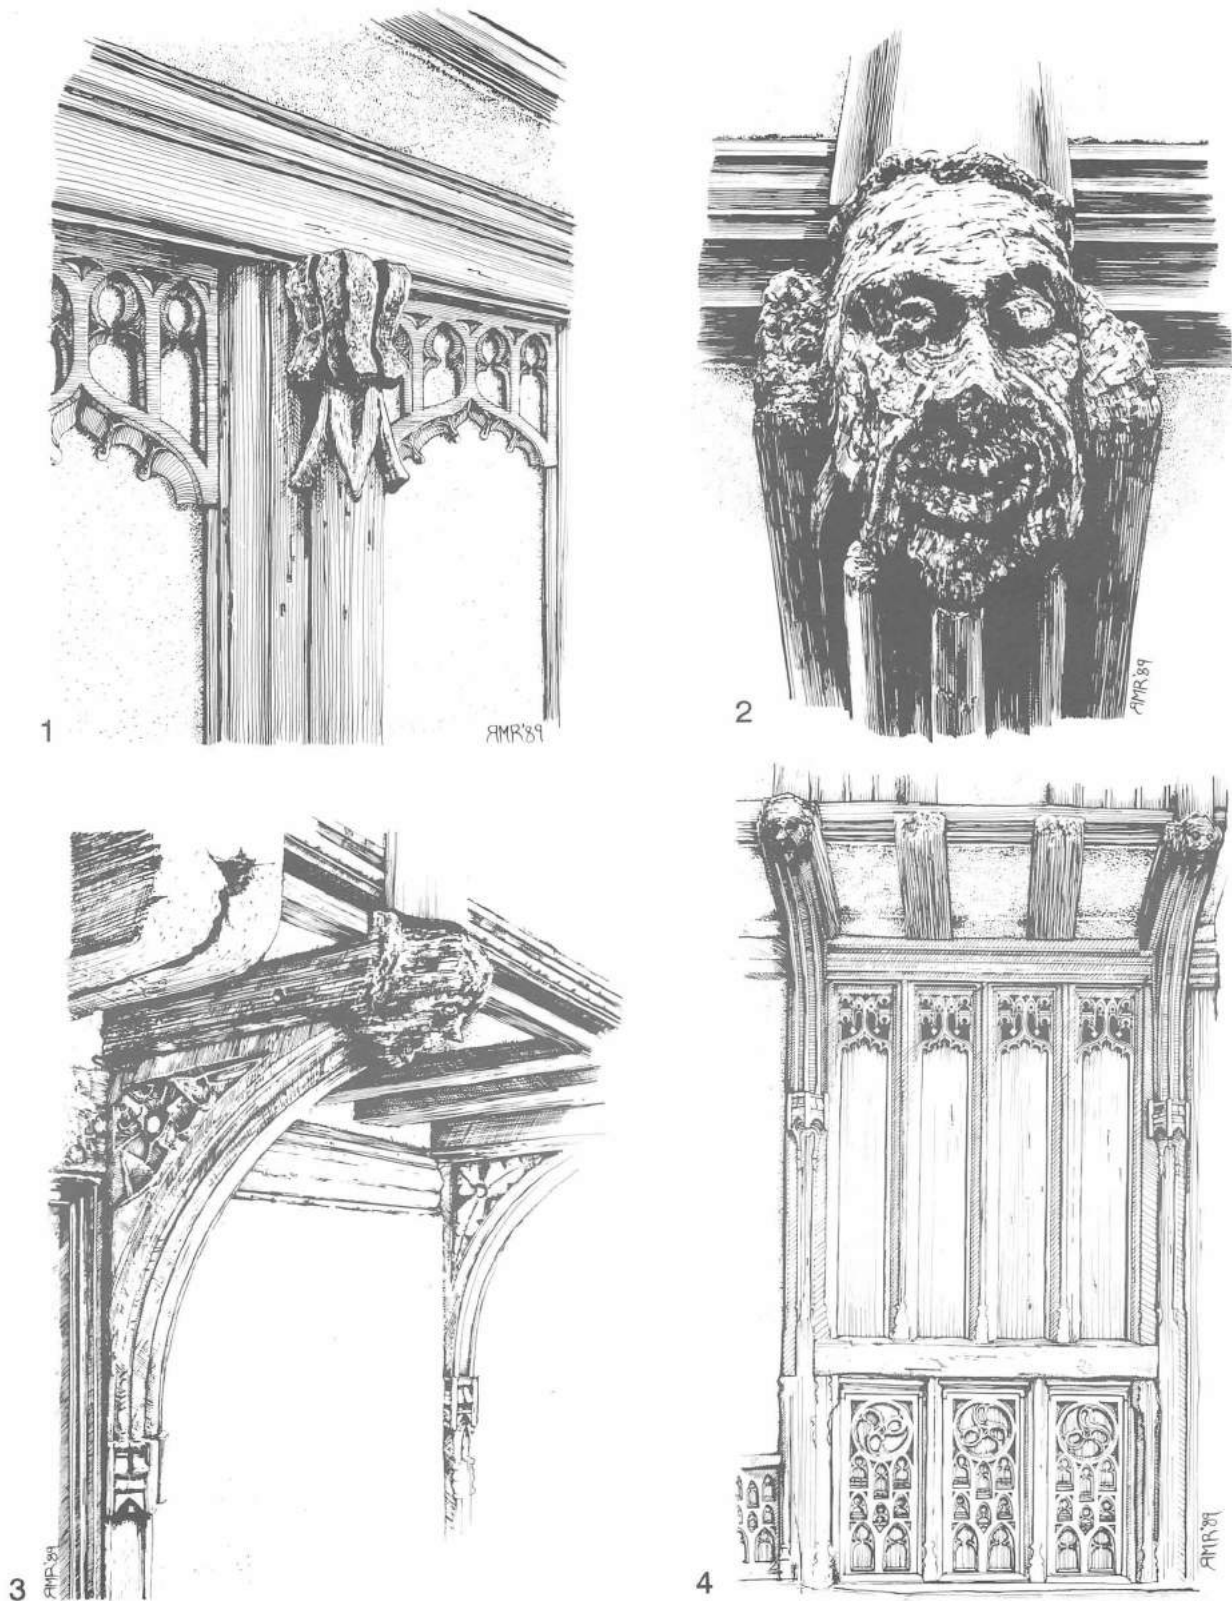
The Red Lion, Colchester. Details of High Street elevation:
